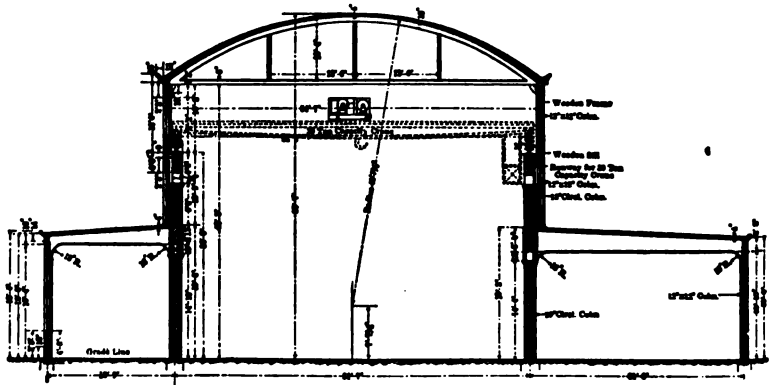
Cross-Section of Taylor-Wilson Mfg. Co.'s Shops.
